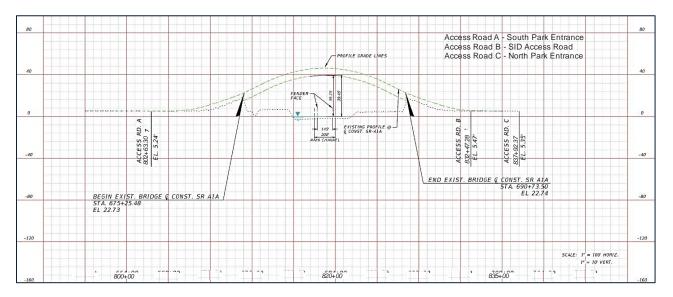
EXISTING BRIDGE PROFILE SECTION
